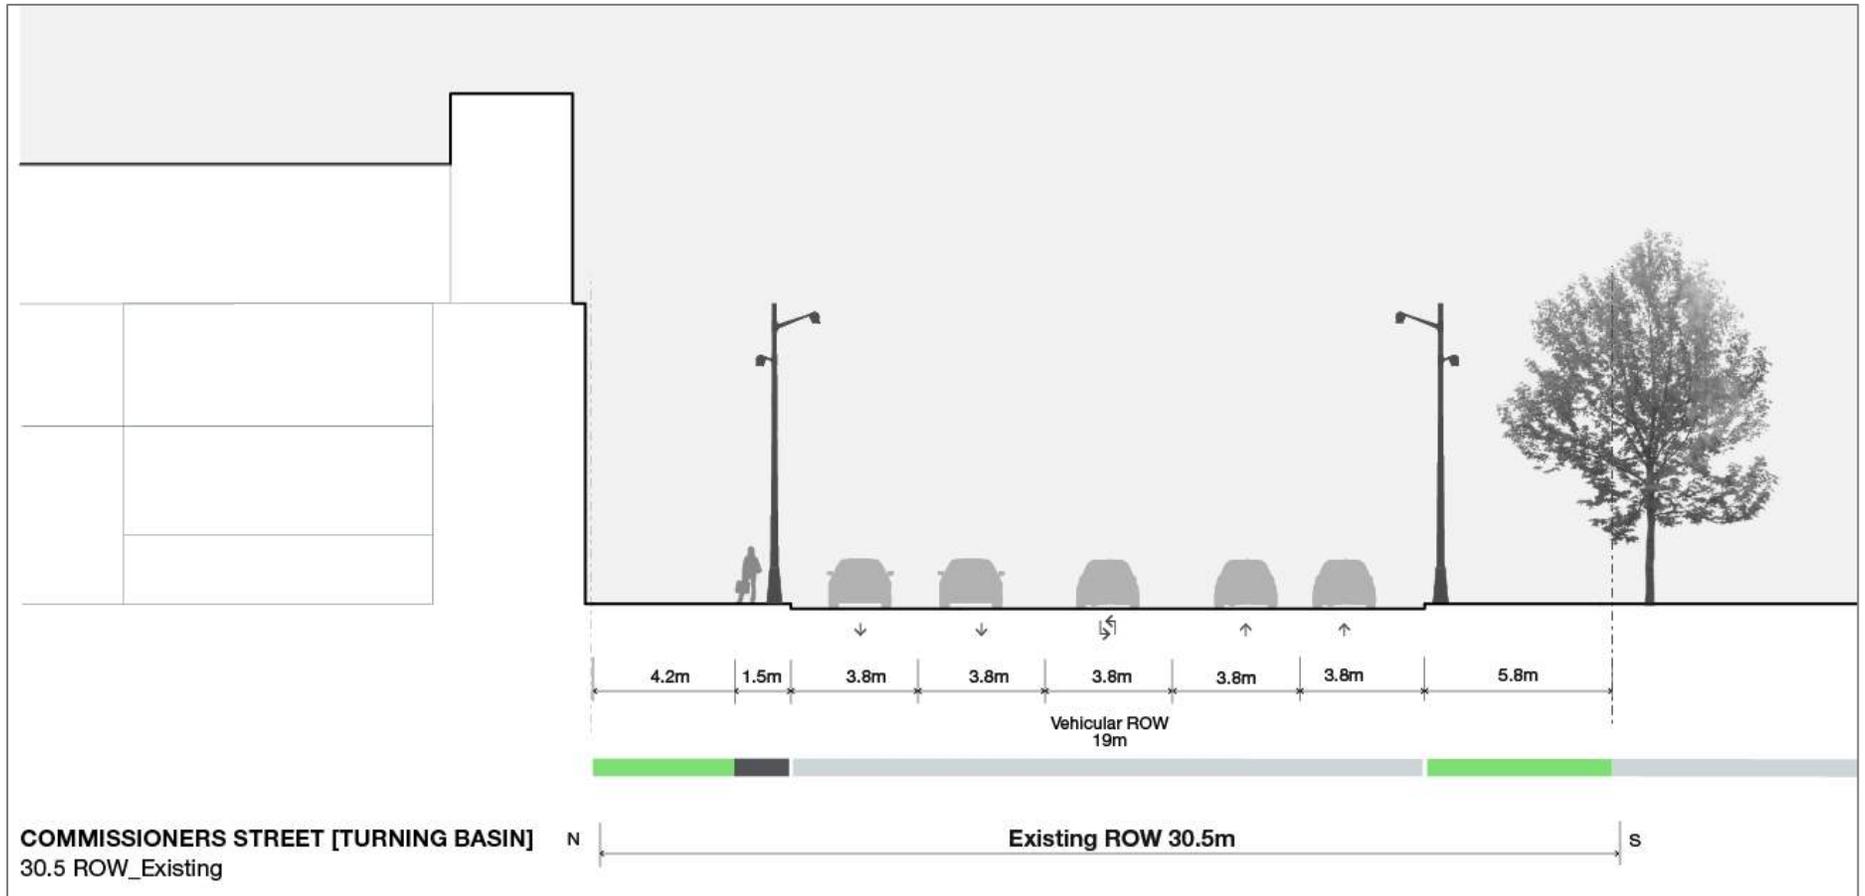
CROSS-SECTION – EXISTING COMMISSIONERS STREET, TURNING BASIN TO LESLIE STREET
